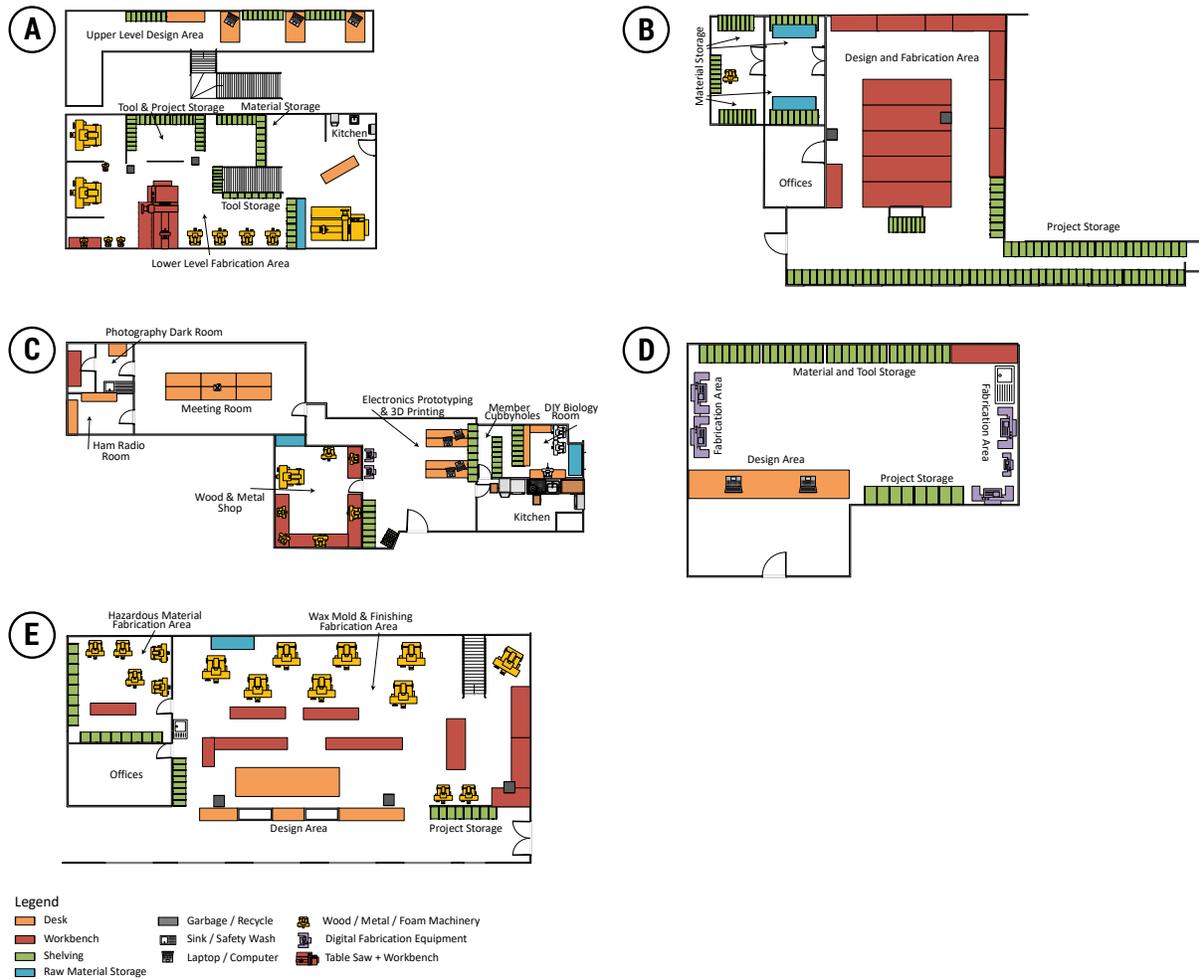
Floor Plans of the (A) Metal Shop, (B) Mold Making Studio, (C) Multi-Use Makerspace, (D) Rapid Prototyping Center, and (E) Wax Studio. Note that the floor plans are not to scale.
